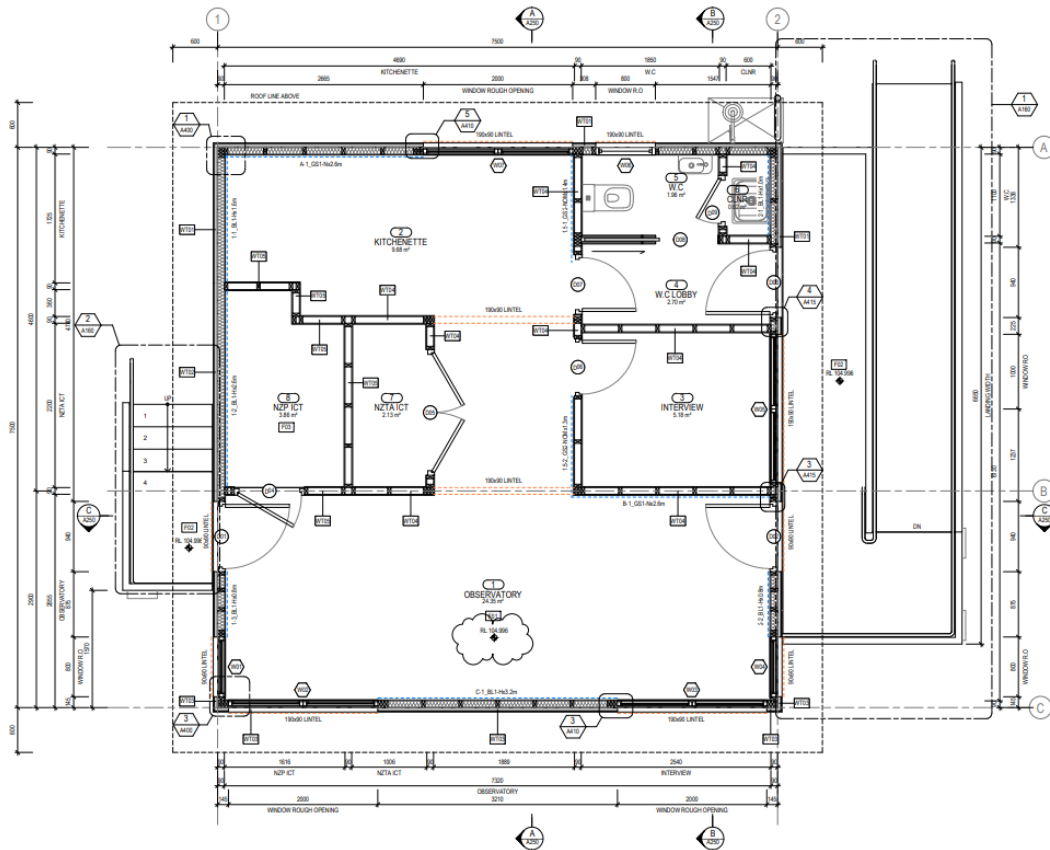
Internal layout of Tier 1.5 Compliance Building. (Source: GHD Woodhead)
